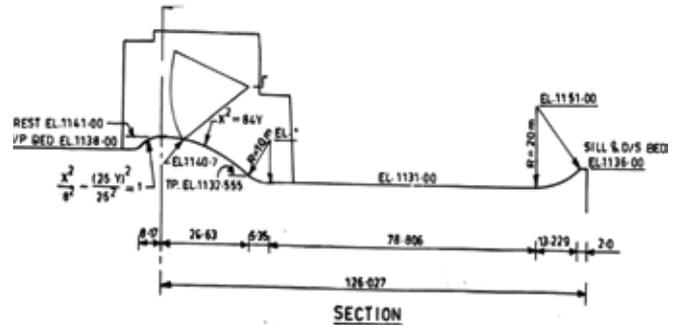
Cross section of spillway with stilling with cylindrical endsill
